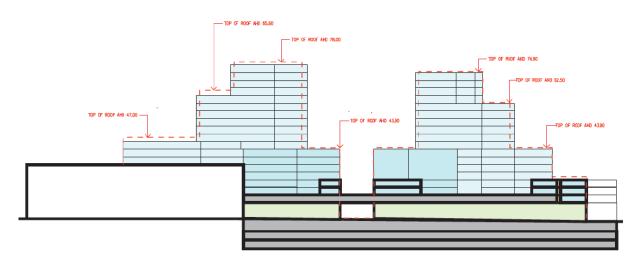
Proposed development and approved building profile DA2007/1249 (shown in dotted red outline)
